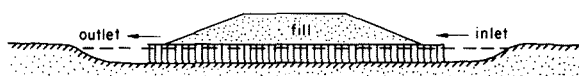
Culverts should not be installed where ditches are lower on each side of the fill than the outlet, because this will cause water to collect to a depth indicated by the dotted line, and the culvert to fill with sediment.
